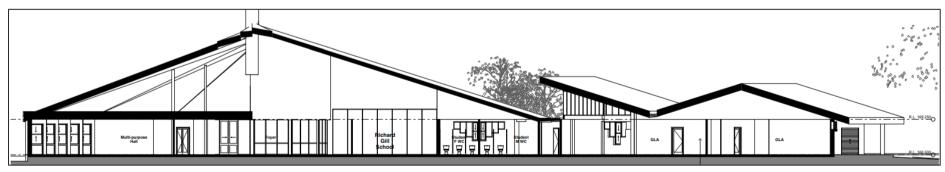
| Section through the existing building showing the learning areas and hall (Source: Applicant's RTS)
